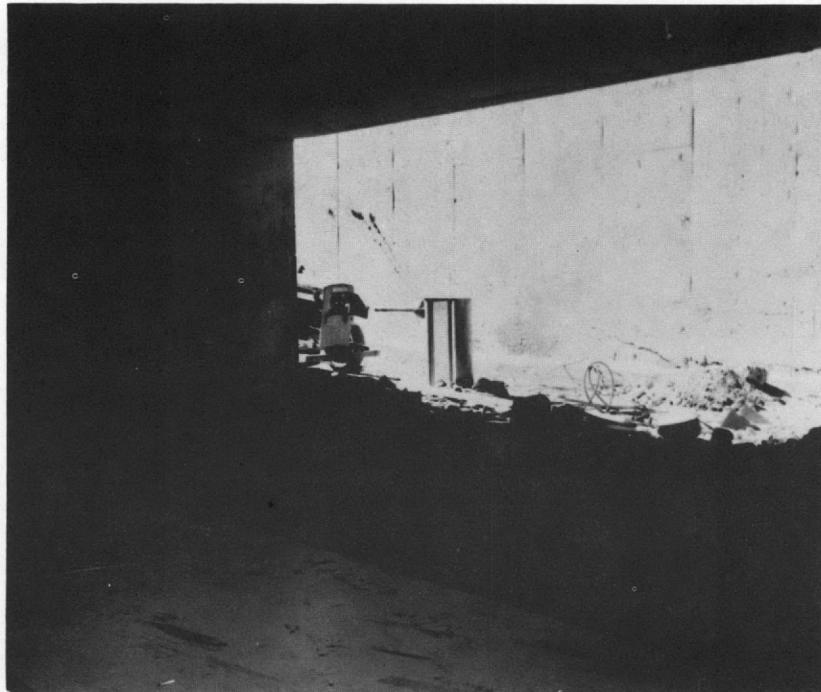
Cracks in ramp side wall opposite door. View from interior of garage through door opening (postshot).
